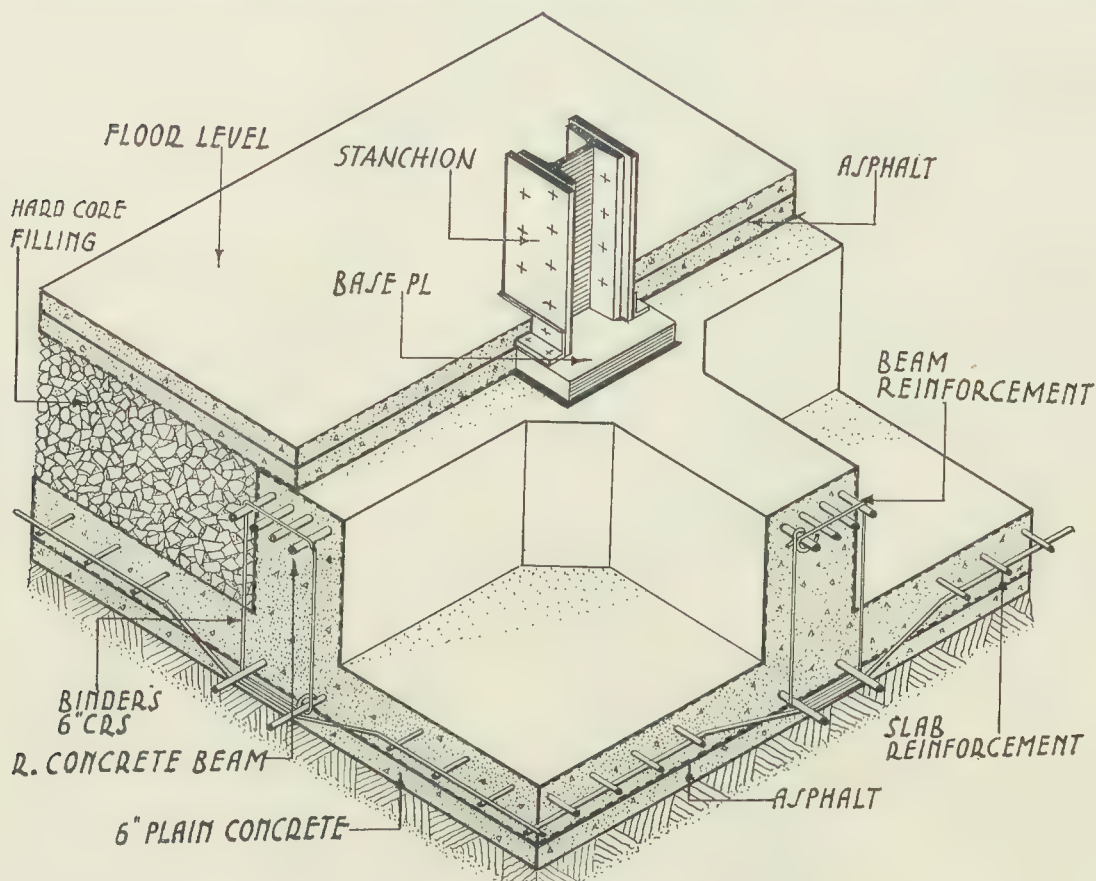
REINFORCED CONCRETE RAFT FOUNDATIONS
